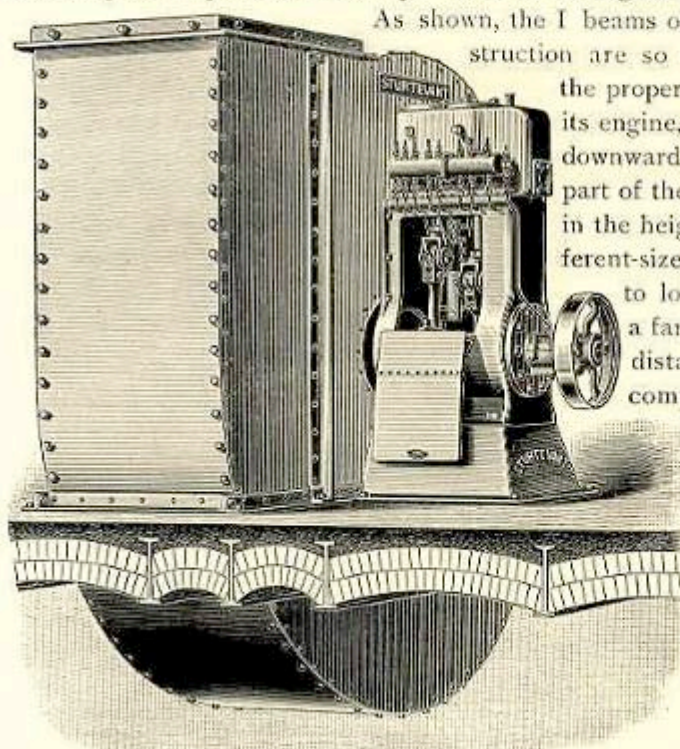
STEEL-PLATE STEAM FAN, THREE-QUARTER-HOUSING TYPE, WITH STEEL-PLATE BOTTOM.
